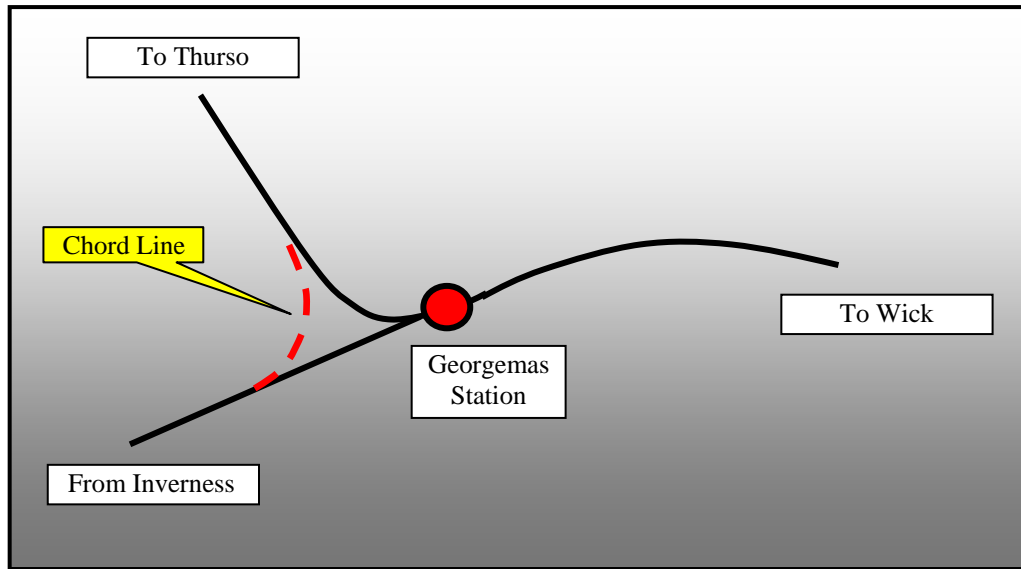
Schematic Plan of Rail Layout at Georgemas
